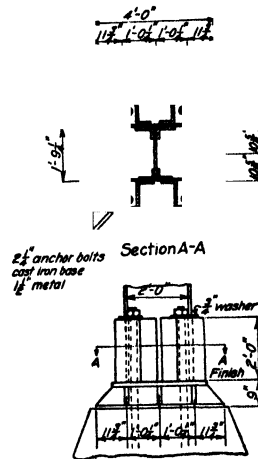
Column composed of two I-beams with diaphragm on cast-steel base.
